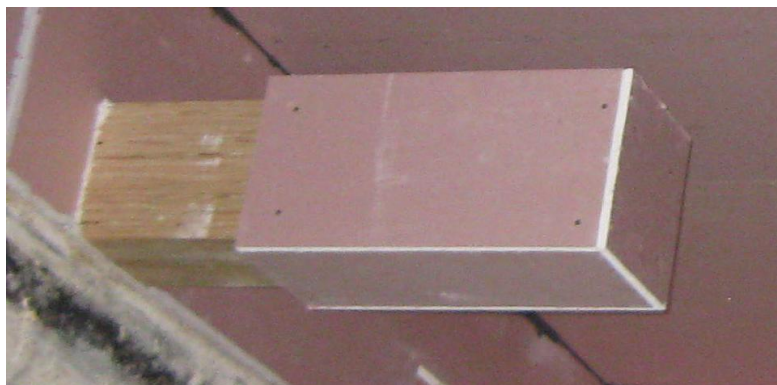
Photograph of GIB protected and timber protected post-tensioning anchorages.
